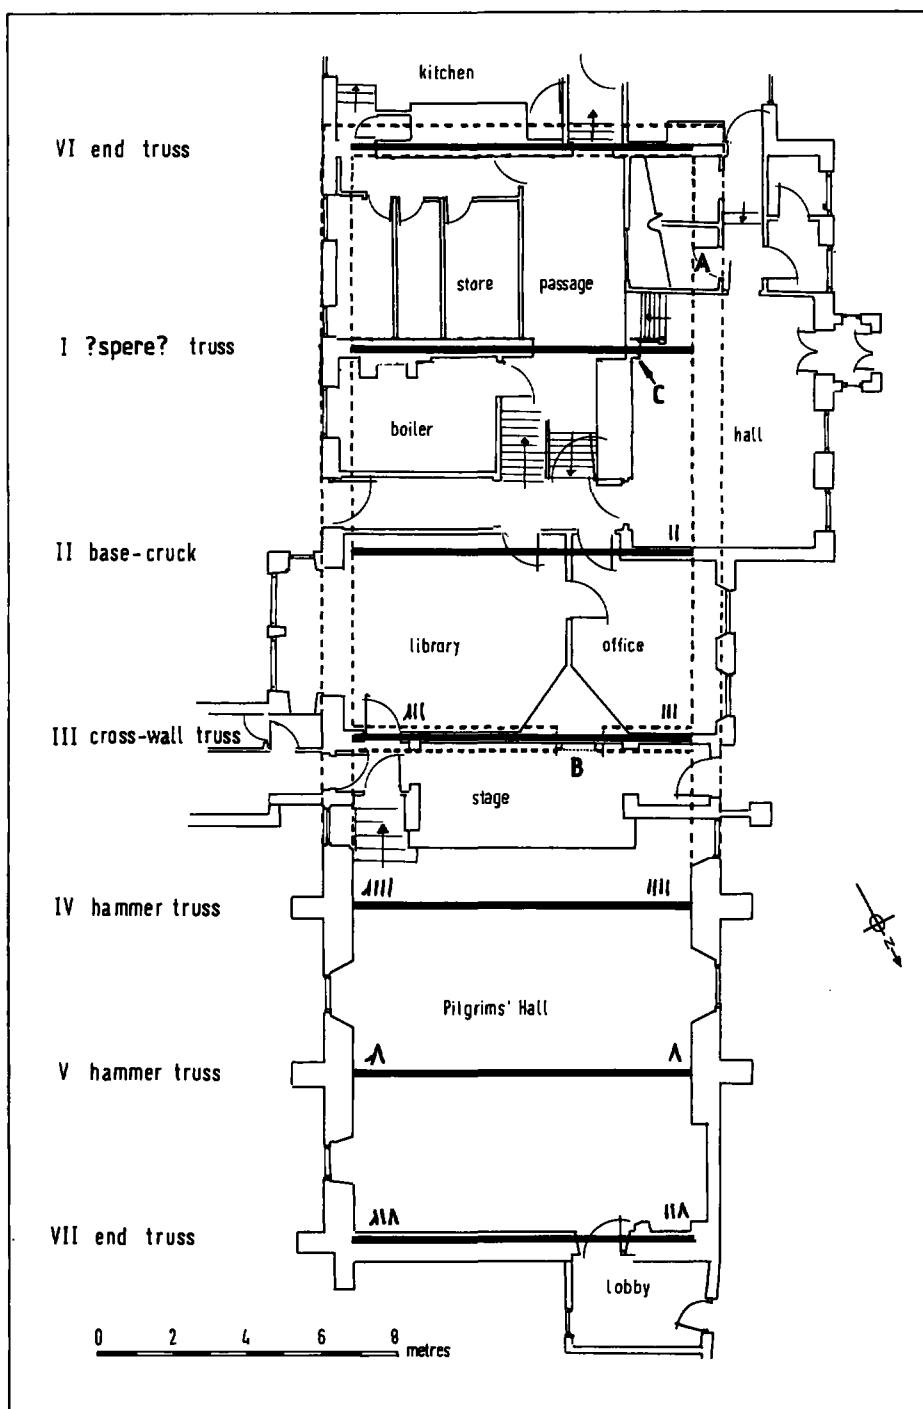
Pilgrims' Hall, Winchester and adjoining house showing position of trusses and original walls. Scale 1:200.
